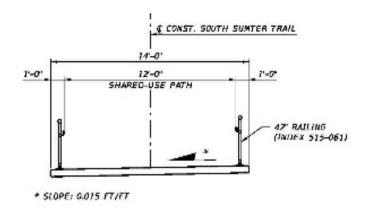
Typical Section – Approach Ramps to Withlacoochee River Crossing
